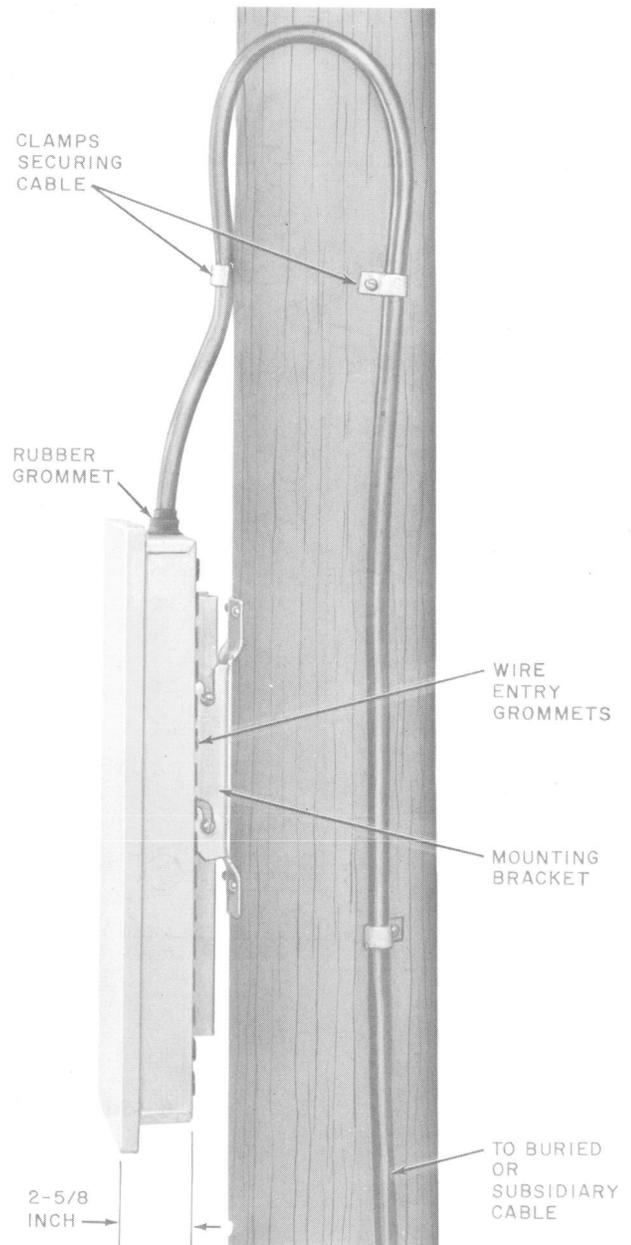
53A3-50P Cable Terminal Installed on Mounting Bracket
